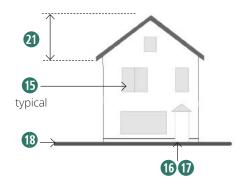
D-2. Commercial Manor Building: Height & Use Requirements
